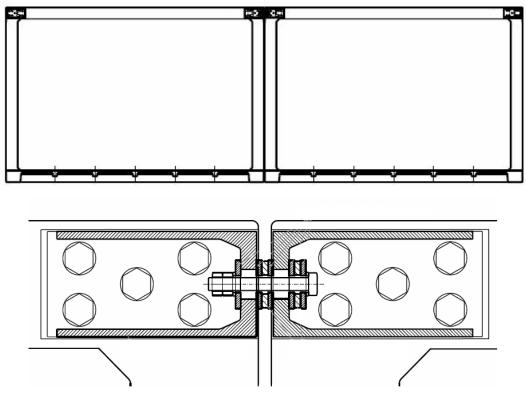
Horizontal connection on structural ceiling (solution 1 of horizontal connection of units).
